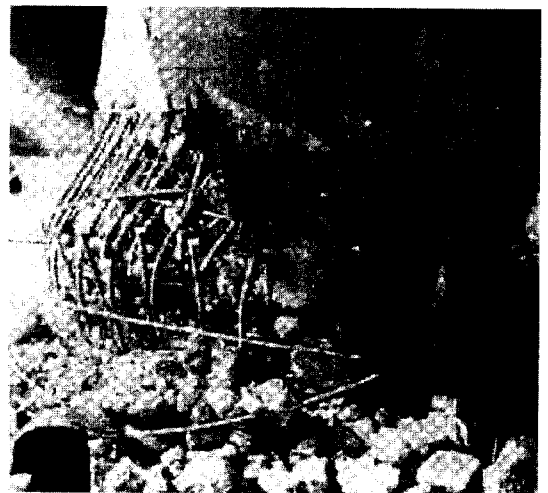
Weld failure of column longitudinal reinforcement
